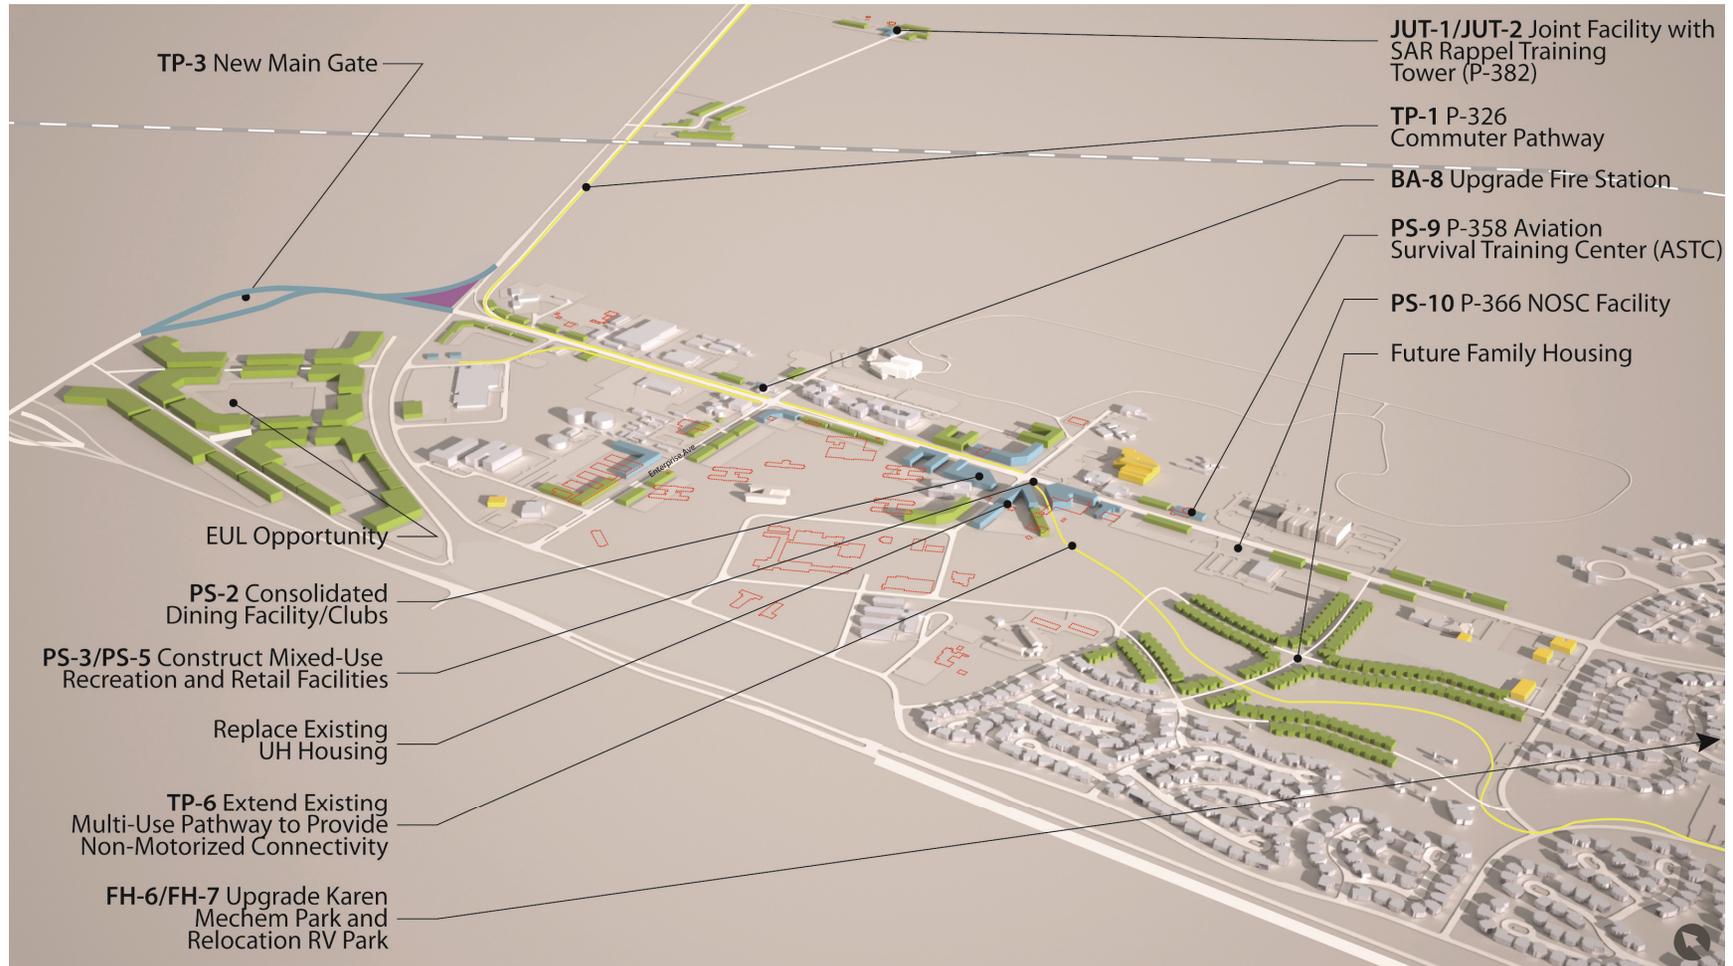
INSTALLATION IMPLEMENTATION PLAN (ADMIN SIDE)
